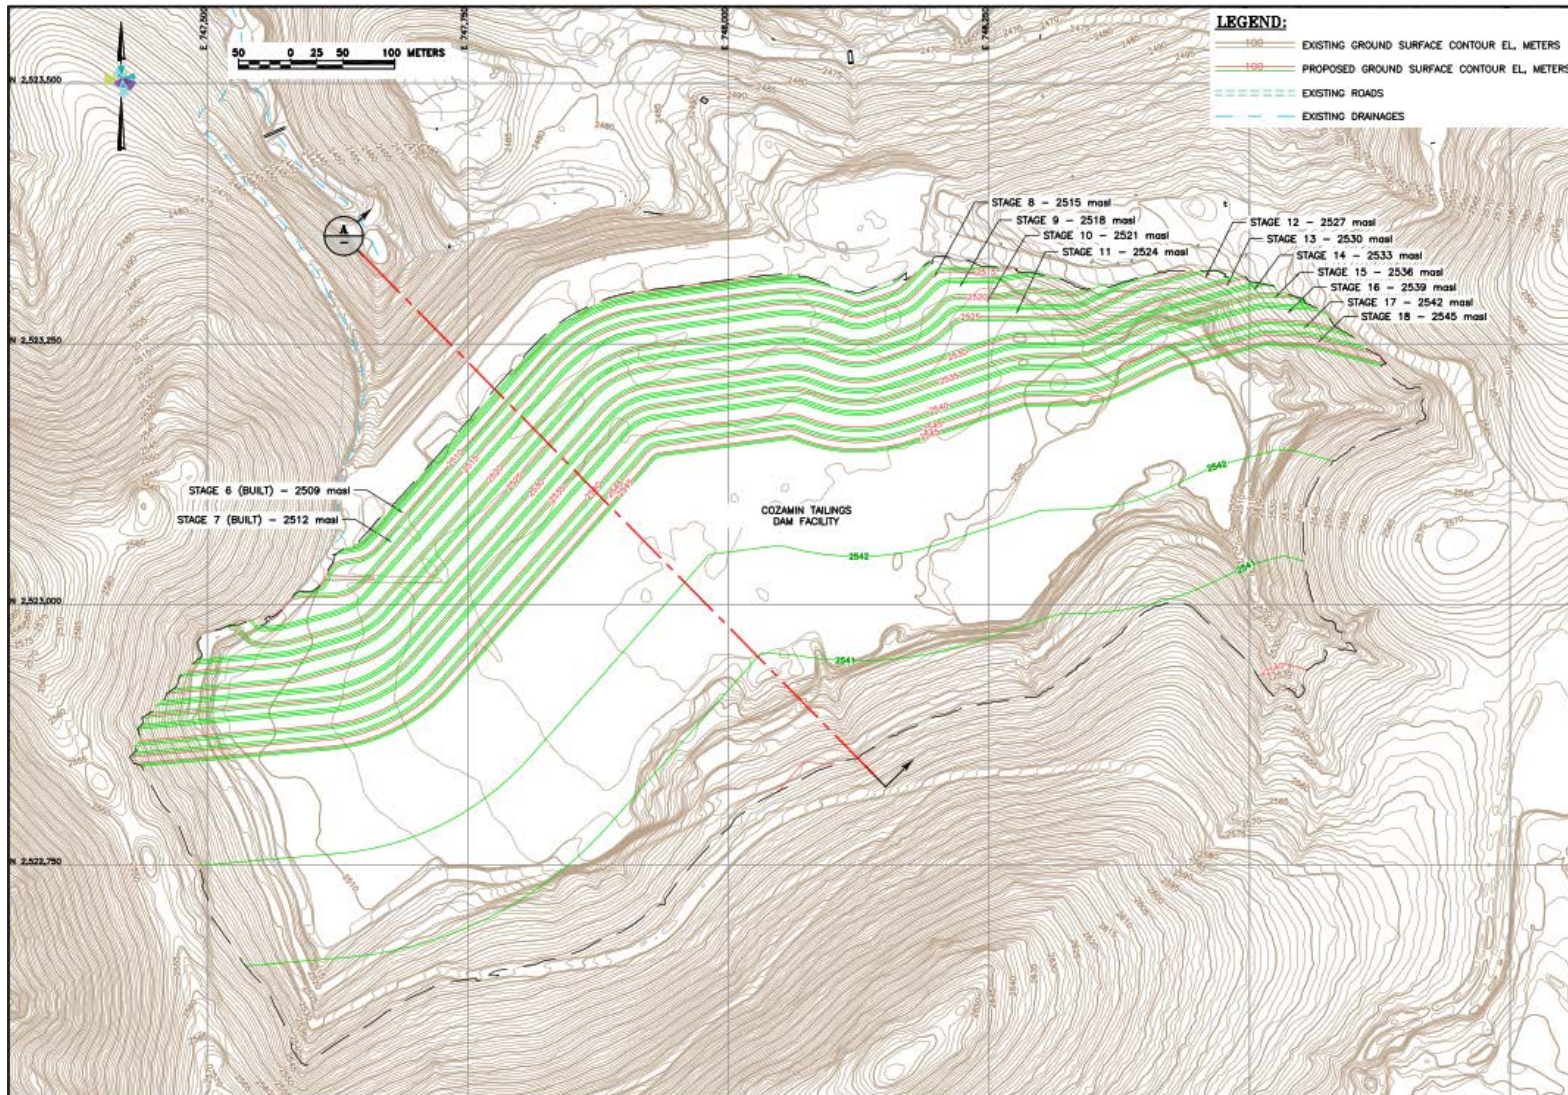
Stages 6 through 18 Expansion Evaluation Plan View (Wood, 2018b)
